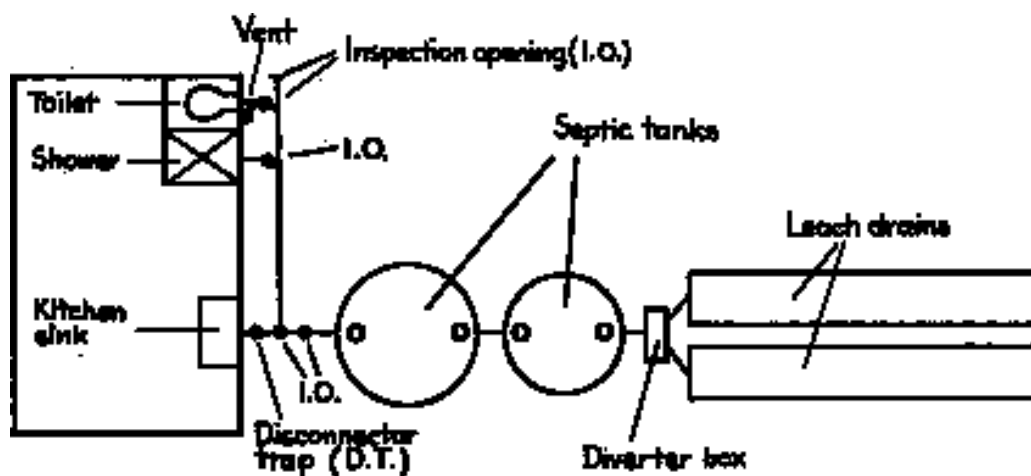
Plan view (top) of an on-site sewage disposal system.
